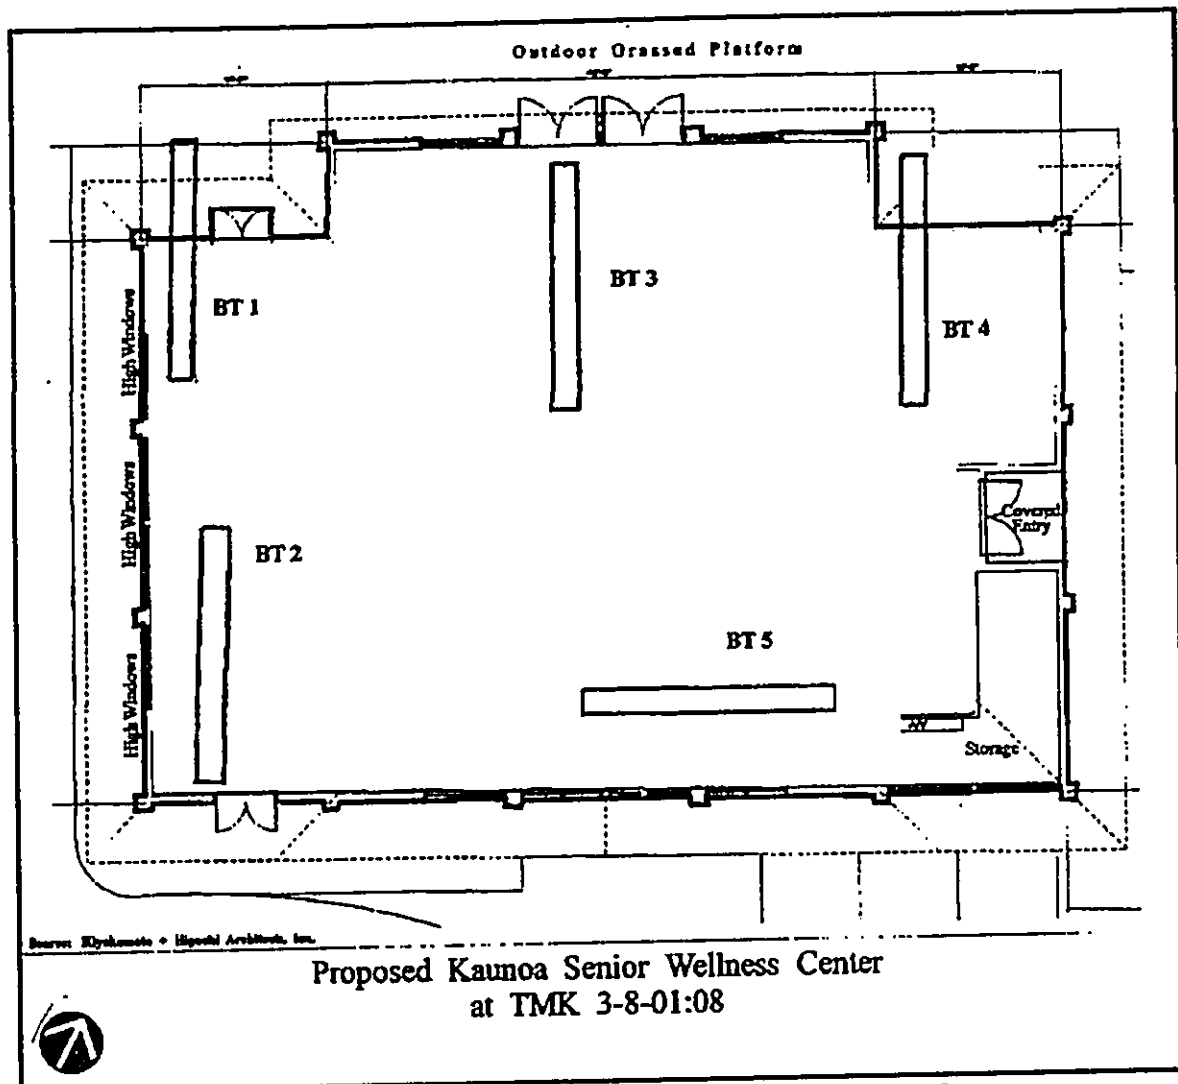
Footprint of building, showing location of backhoe trench tests.
